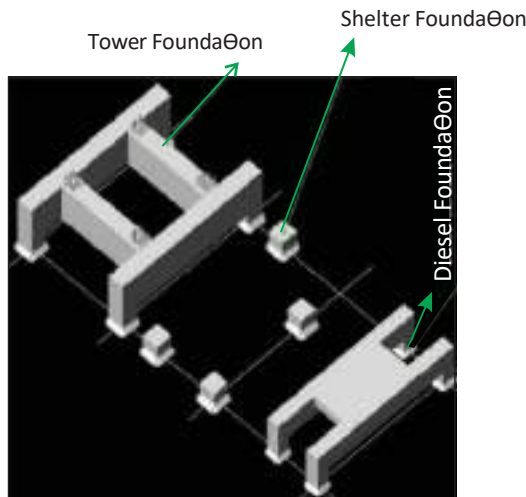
Design for a Roof Top Tower (RTT)
